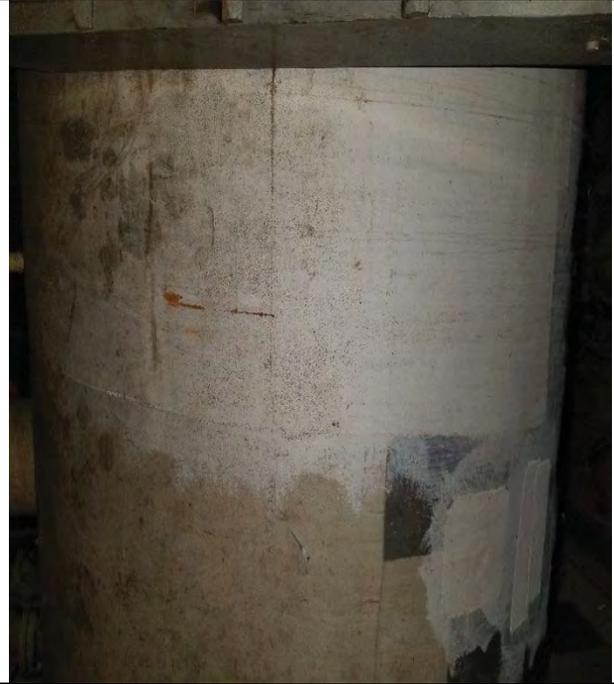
Parged pipe wrapping located in the Sewage Room 120A. Presumed asbestos containing.
